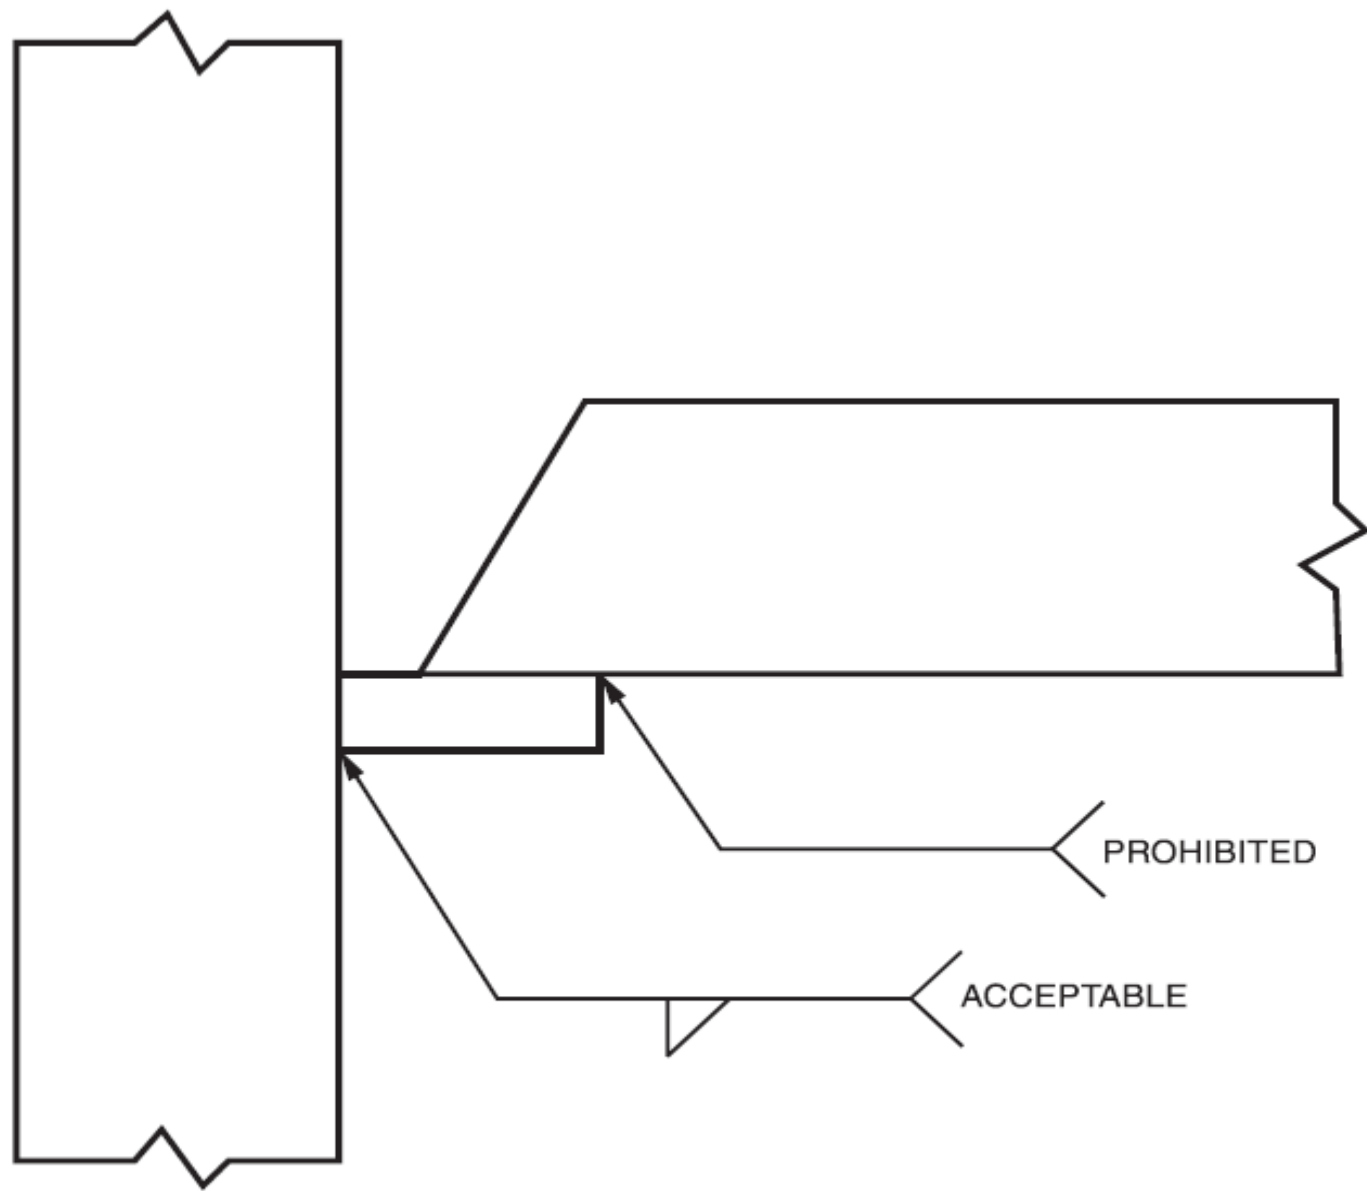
Beam Flange to Column—Fillet Welds at Left-in-Place Steel Backing (see C-6.9.1, C-6.9.2, C-6.9.3)
